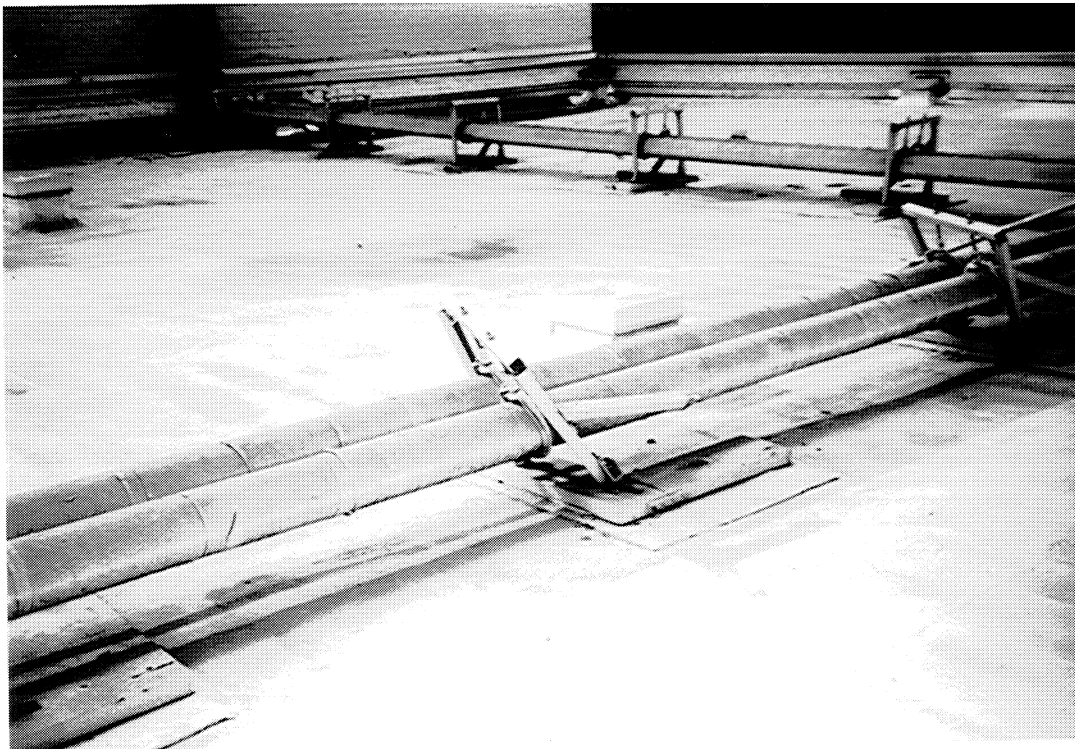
Amplified motion on the roof of a CO has caused the failure of HVAC piping supports.
